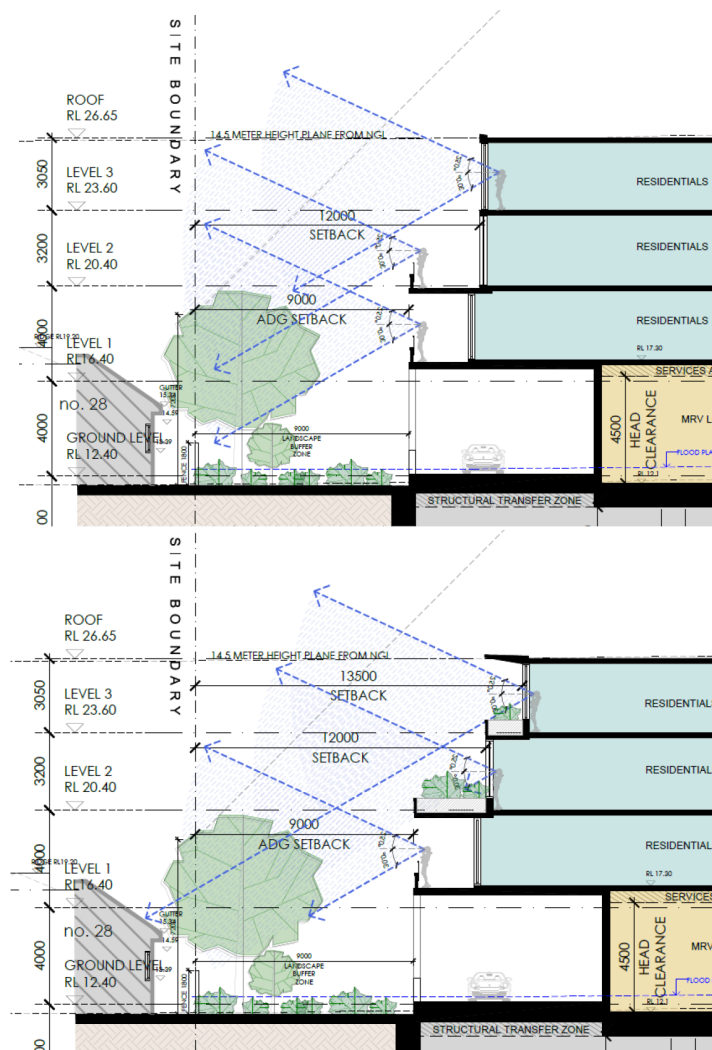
Proposed building setbacks, previous (top) and revised having considered the advice of the Woollahra LPP (bottom) (Source: Ethos Urban)
